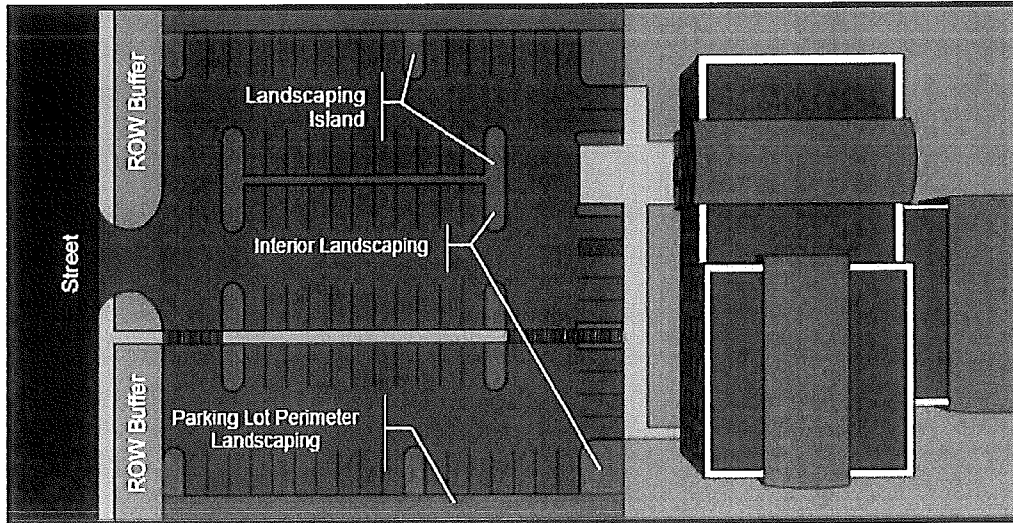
Island, Interior, and Perimeter Landscaping Plan View Illustration
